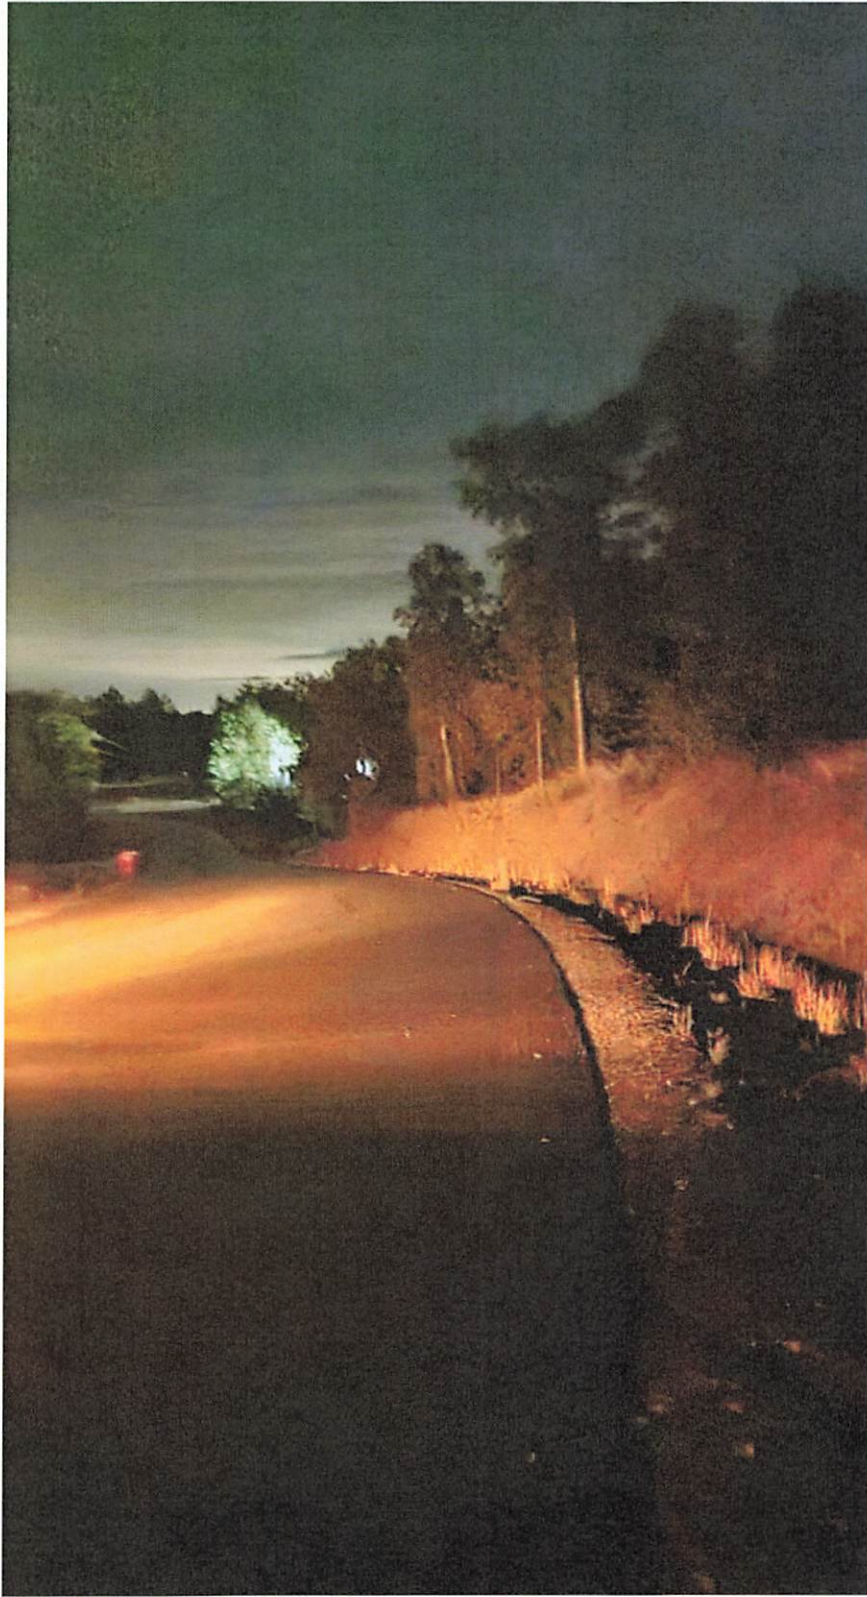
Look towards the right of new proposed road site with flash on at 5:30 am on 9/15/2026
